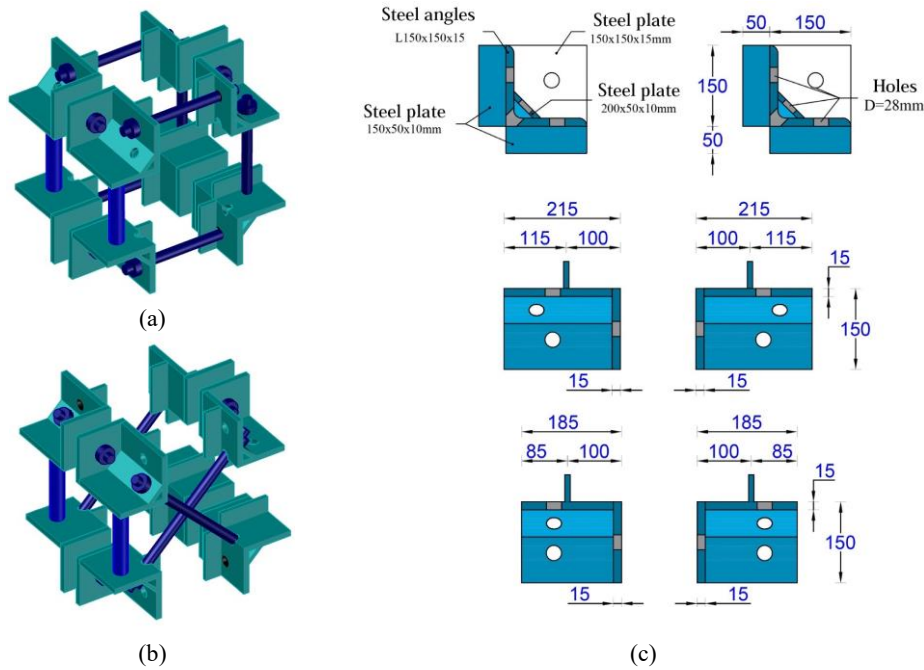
Retrofitting system details a) Horizontal-vertical pattern (HV); b) Diagonal pattern (Di); c) Retrofitting parts detail.
